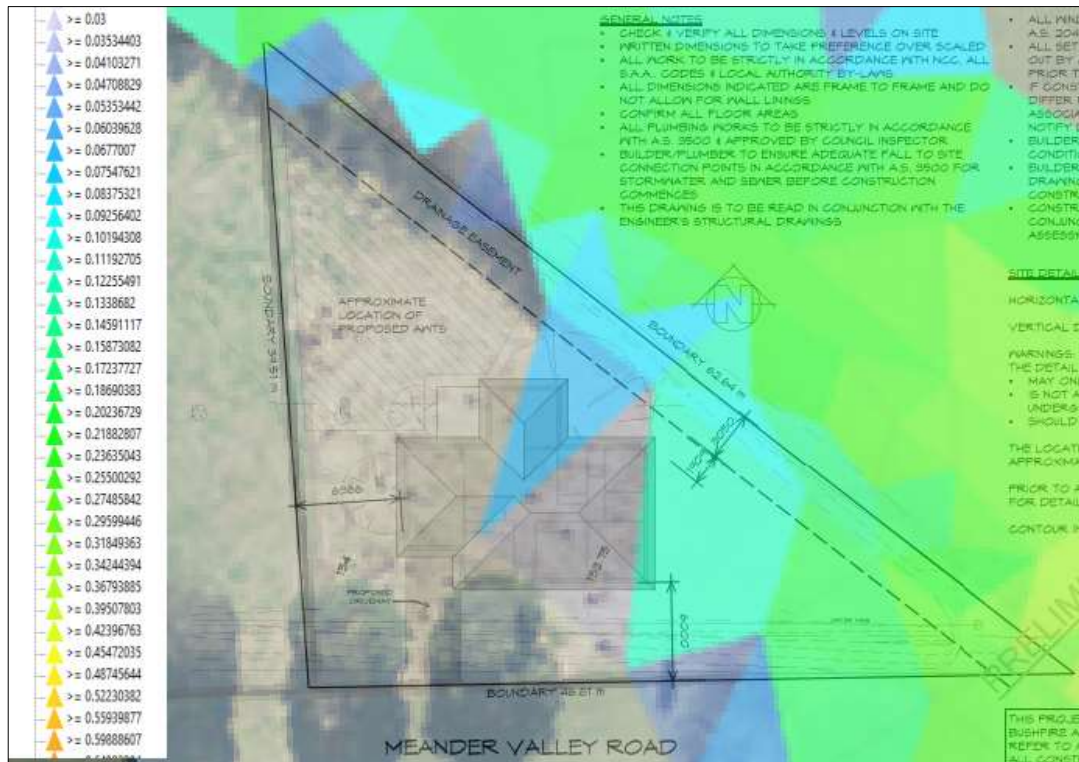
flood modelling overlaid with proposed site plan (key - depth in metres)
